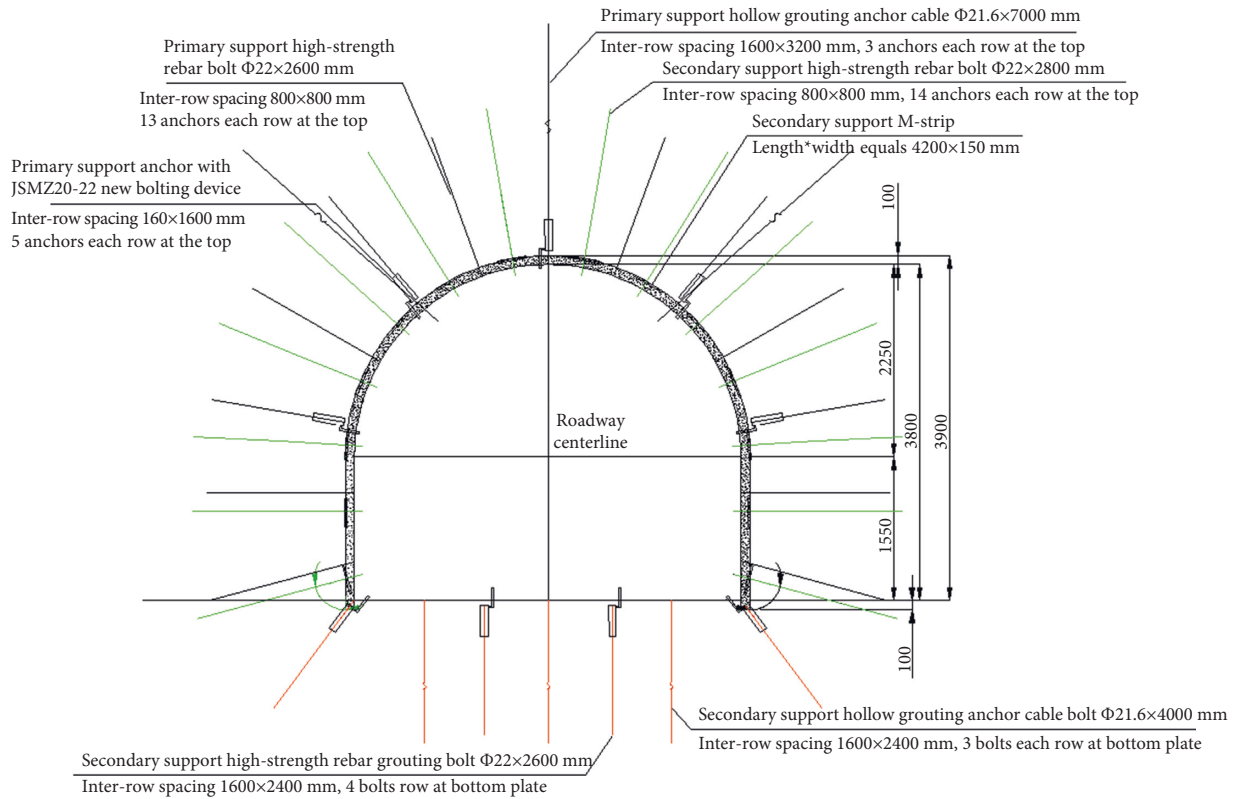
Full-section of bolt-net-cable-grout coupling support.
